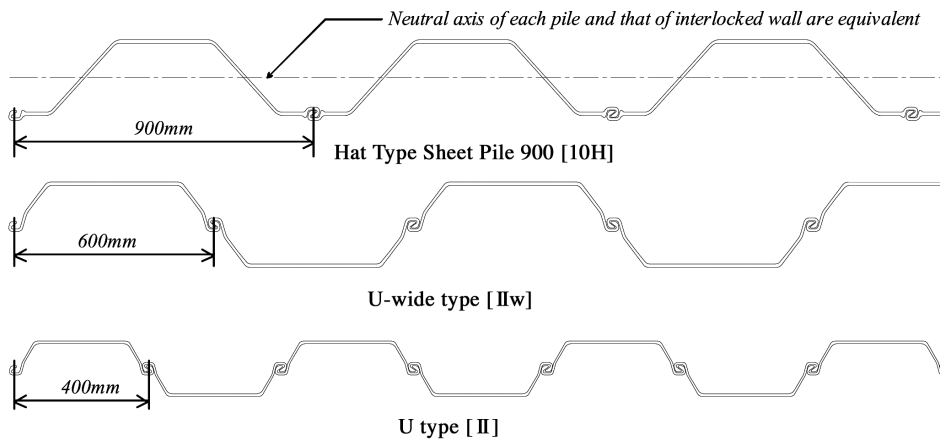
Comparison of Hat-Type Sheet Pile 900 and U type sheet pile
